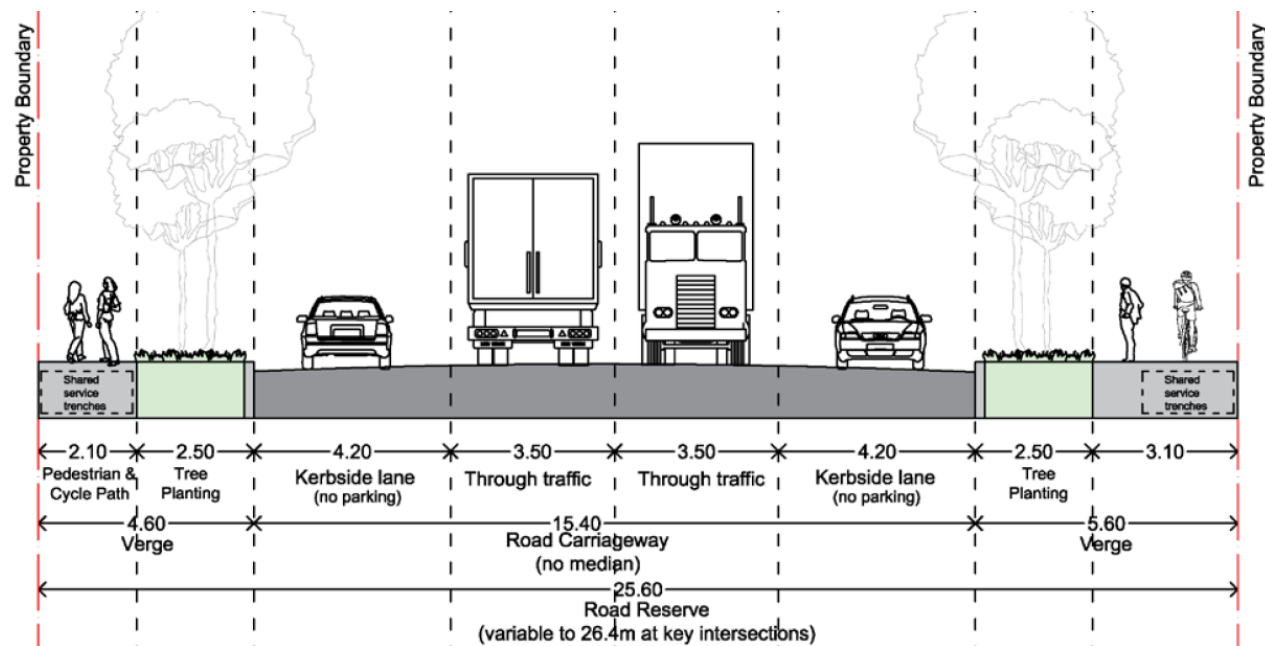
| Mamre Road Precinct DCP – Typical Collector Road (Type 2)
